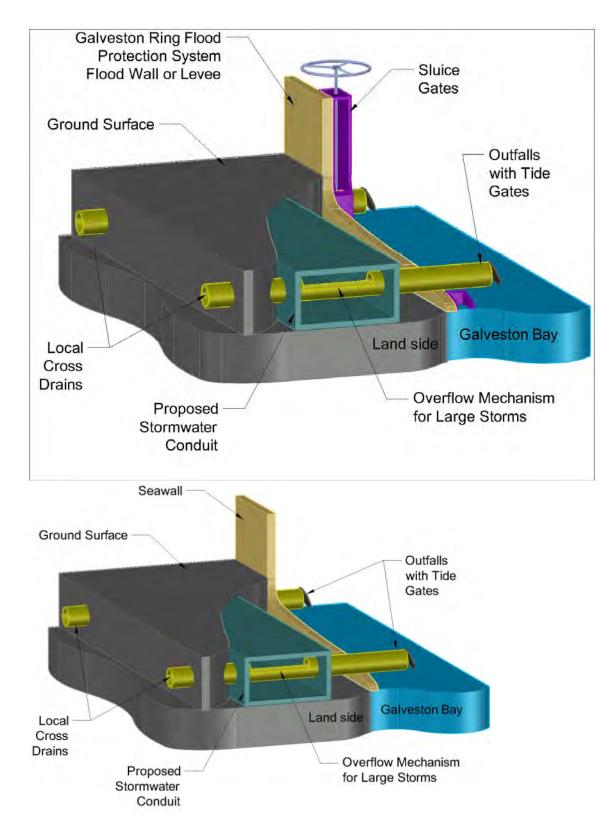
Proposed stormwater conduit connection with existing drainage network.
